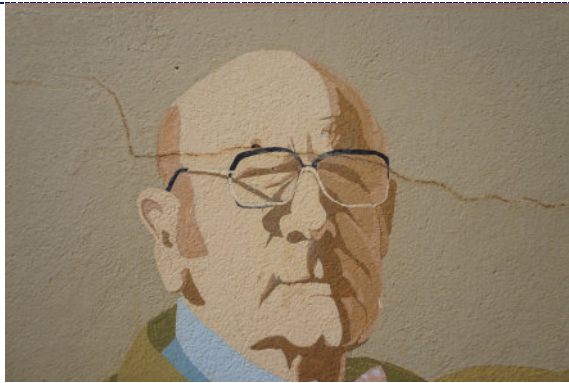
Detail – surface cracks and deformation to the mortar; chalking (UV degradation) and fading of the paint; staining to the exterior of the cracks; accumulation of biomatter.
